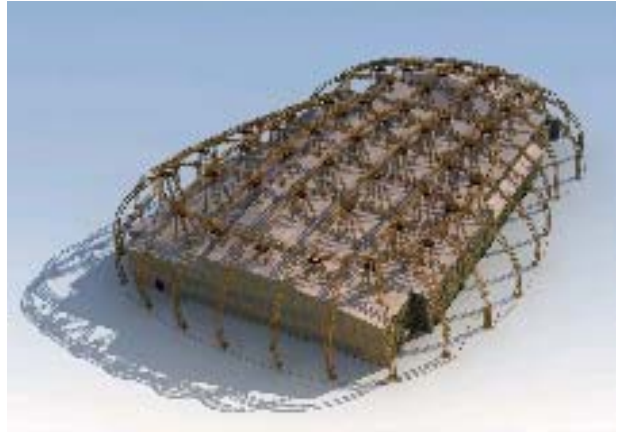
(1) Covered and jointed to the main building by Bamboo Truss
